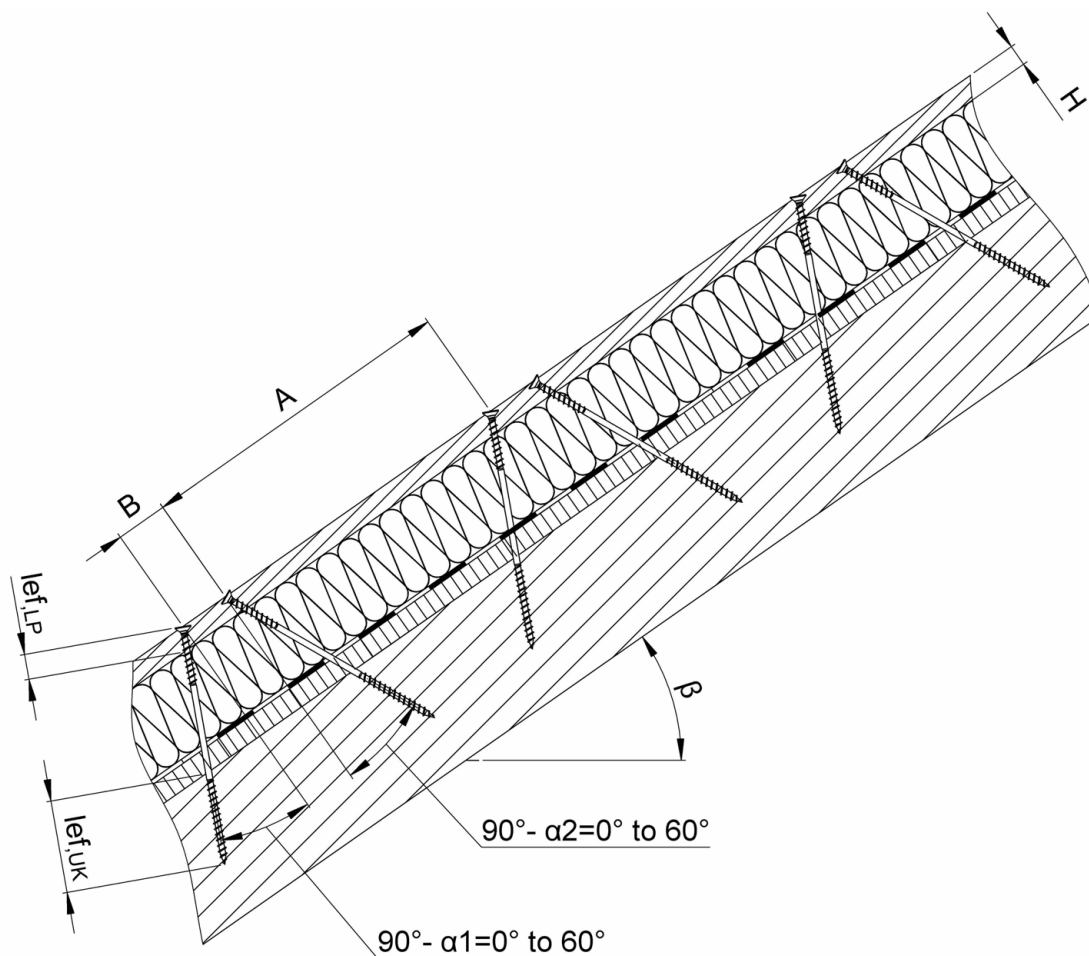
Fastening of thermal insulation material on top of rafters - structural system for alternatively inclined screws
